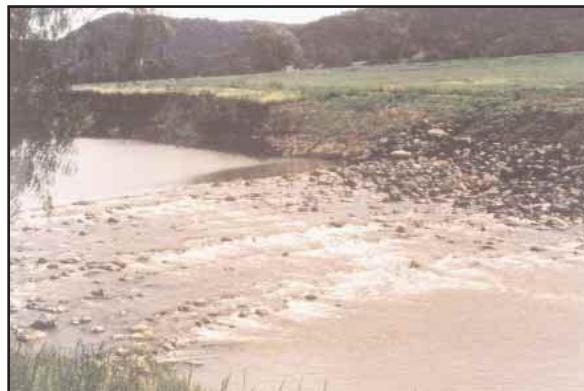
Rock grade-control structures in Bell River (Wellington, New South Wales) have been constructed to protect the bed, but also incorporate a low gradient to allow fish passage (figure by Wal Hader).
